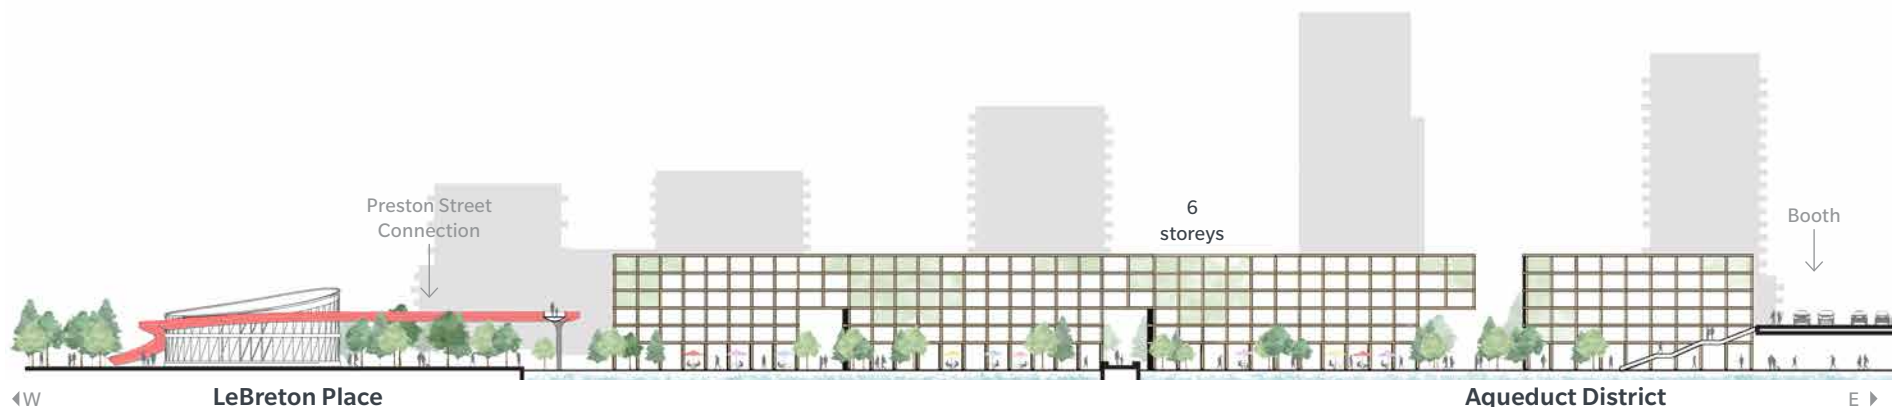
Sectional elevation (east to west) illustrating the Preston Street Connection and the Aqueduct District.
